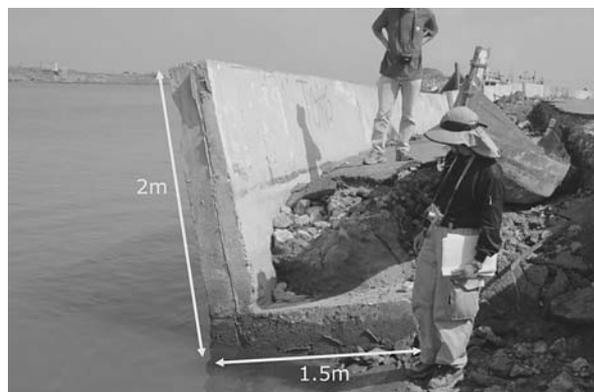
Tilted and dislocated L-shaped river protection at Lampulo
